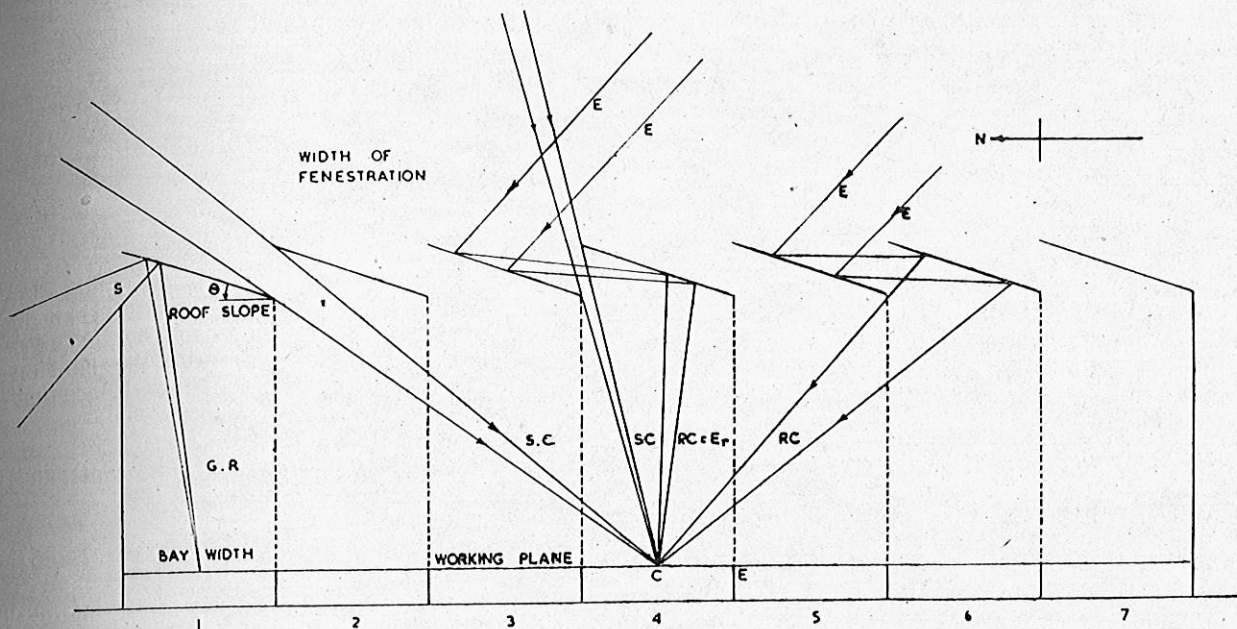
ELEVATION OF A FACTORY WITH SAWTOOTH NORTHLIGHT OPENINGS
